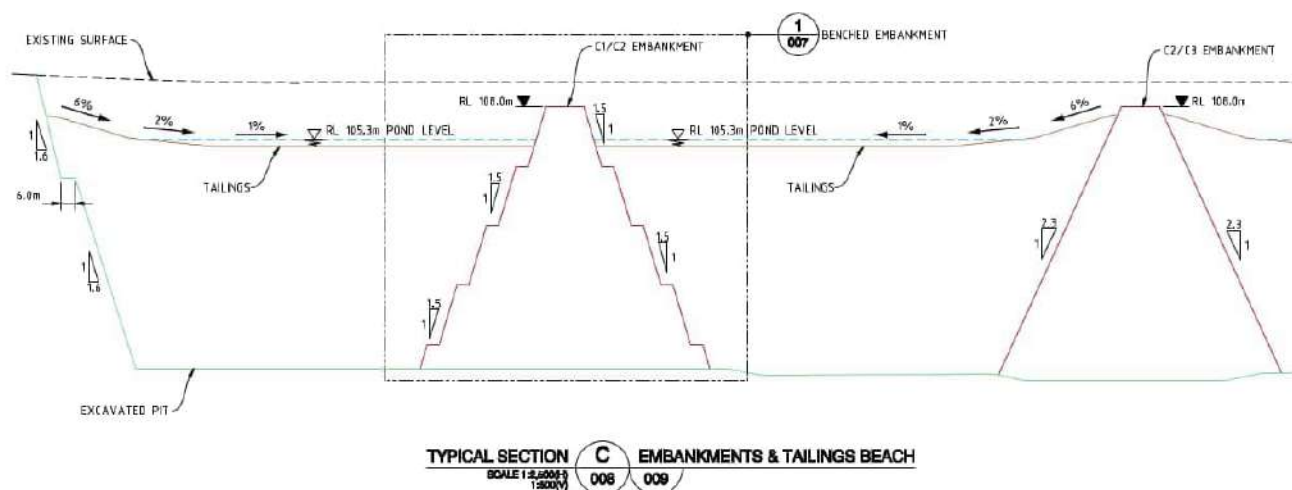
Typical embankments and tailings beach (ATCW, 2025)
